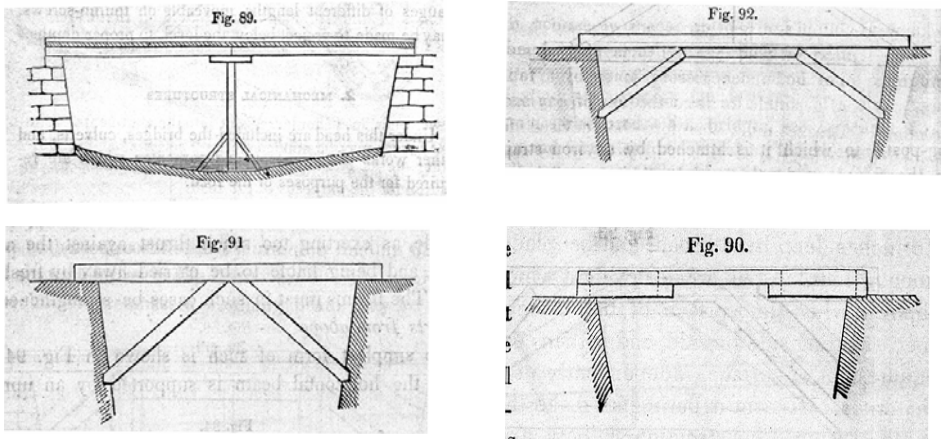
Simple bridge construction methods using timber planks (Gillespie, 1868:174-5).
